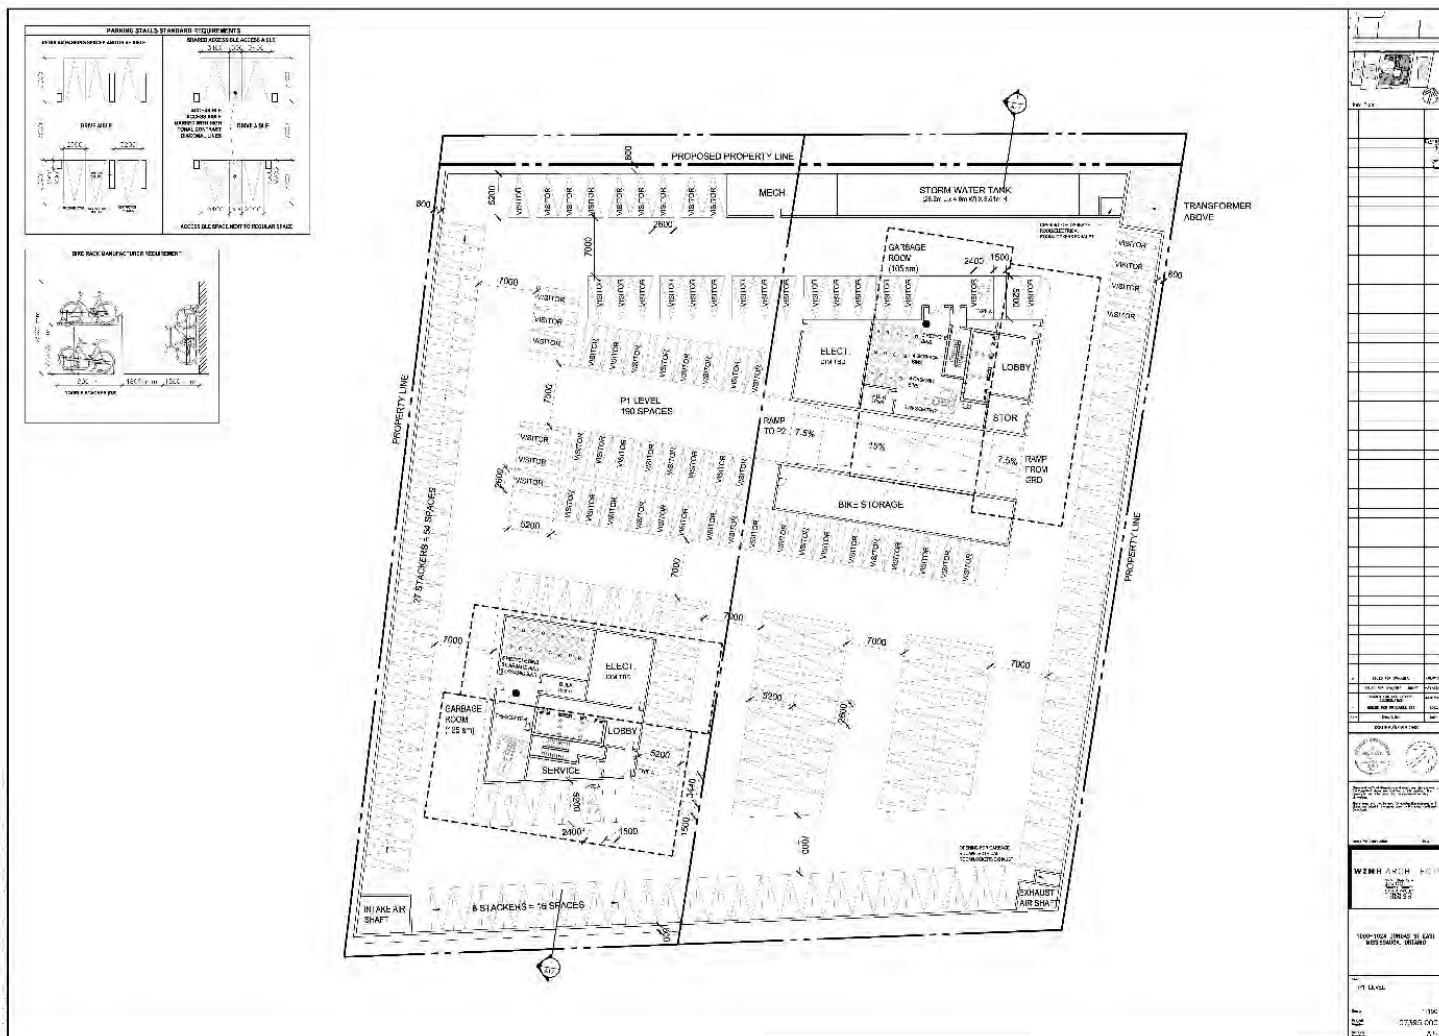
Figure O -Parking Level 1 Plan for Proposed Mixed Use Redevelopment for 1000 and 1024 Dundas Street East showing visitor parking which shall be used by the commercial tennants.
